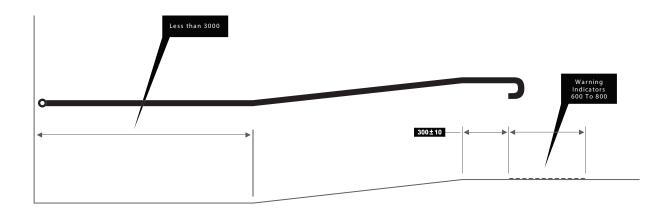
A: Warning Indicators - Ramps. Side elevation where top of ramp leads to an open area and the bottom landing is enclosed, less than 3000 wide and handrail is continuous
